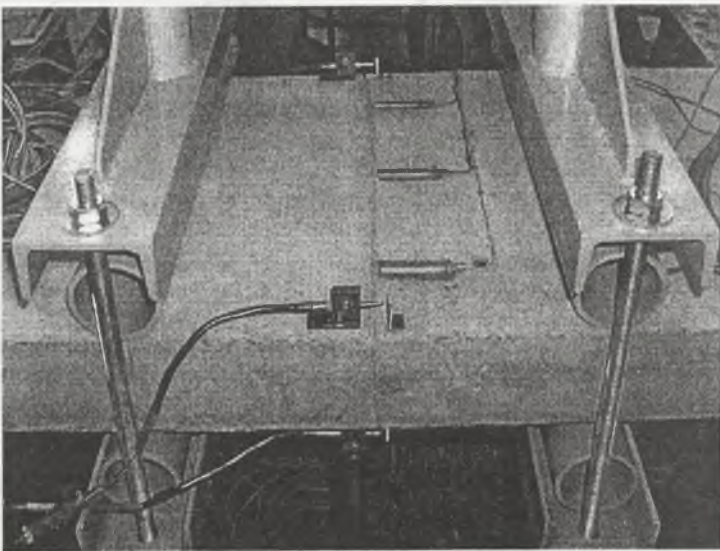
Scheme of test stand: 1 – bearing, 2 – tested element, 3 – beam, 4 – electrical strain gauges, 5 – inductive gauges on accuracy 0,01 mm, 6 – inductive gauges on accuracy 0,001 mm
